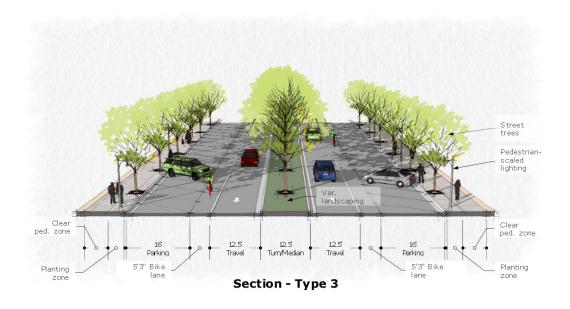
Configuration and dimensional requirements for street section Type 3 areas identified in the Street Section Plan.
